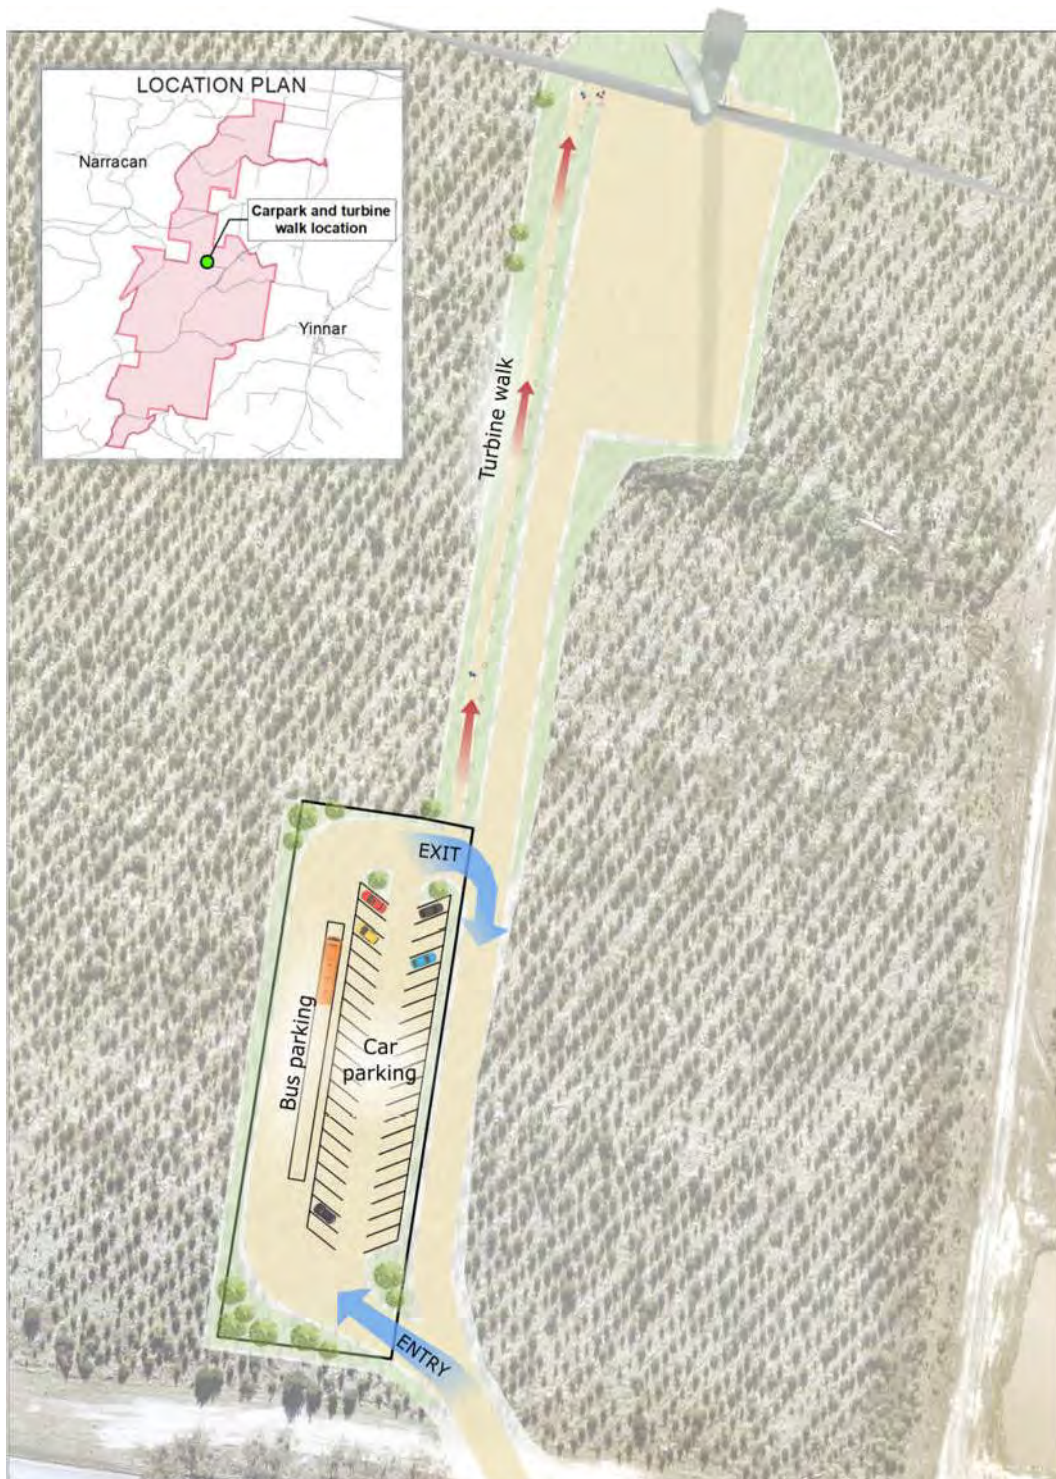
Proposed Secondary Visitor Area Site Plan
